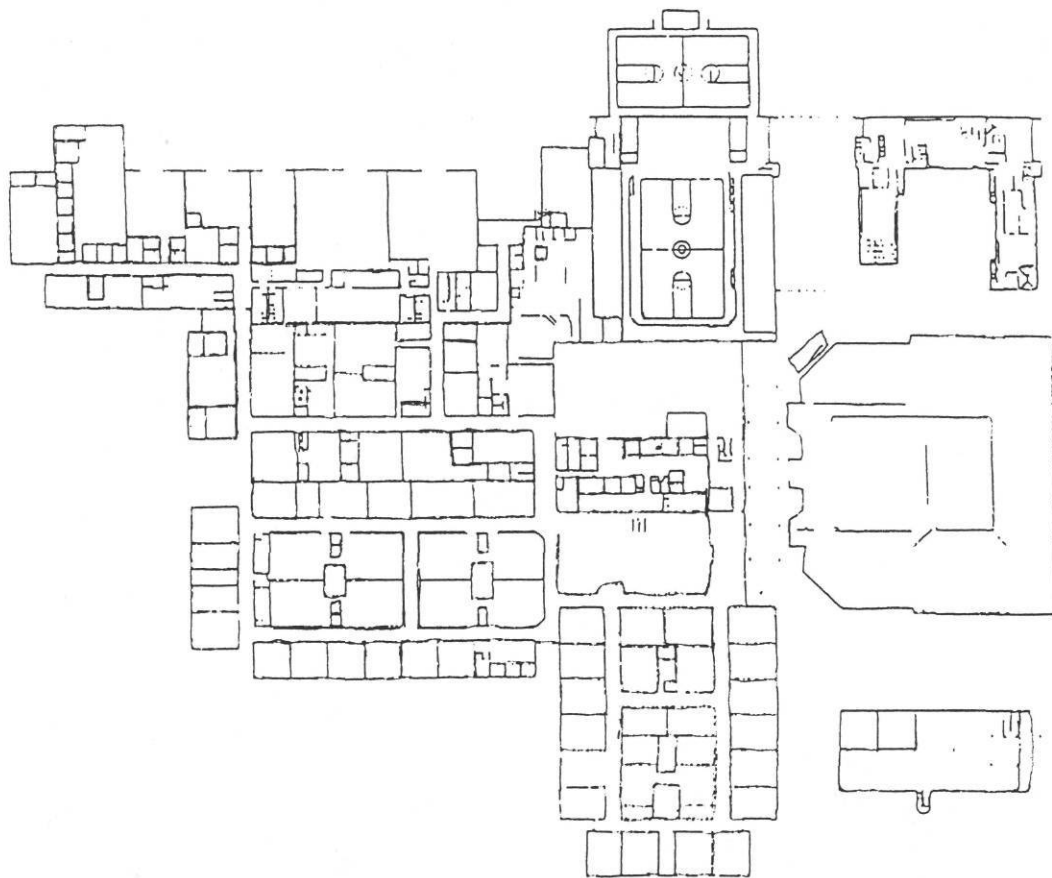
Floor Plan of Nacogdoches High School (NHS) (adapted from Landman, 1996a)
